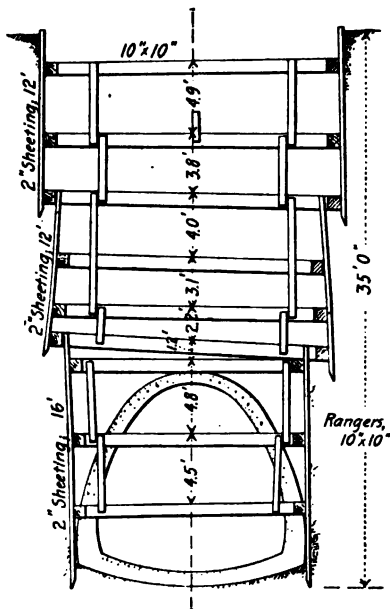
Poor sheeting for sewer 12 ft. by 12 ft.
